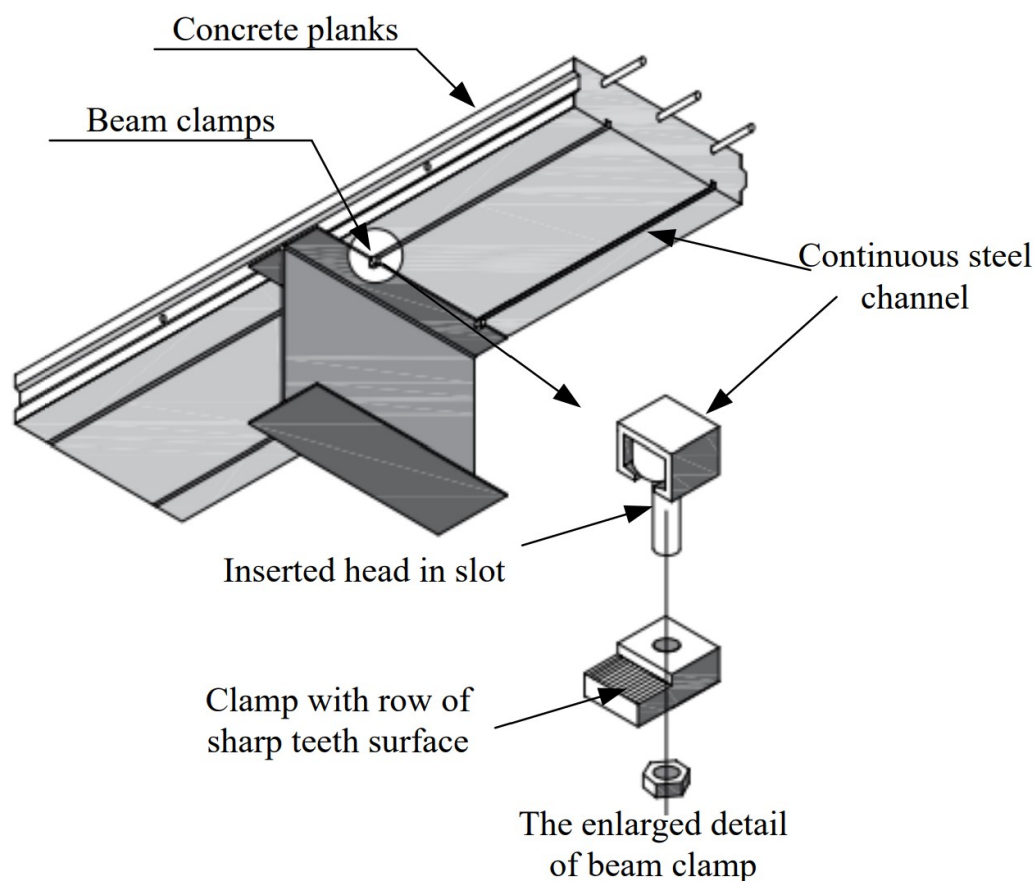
Demountable connection, connecting concrete plank and steel beam (Al-Ghalib and Ghailan, 2020).
